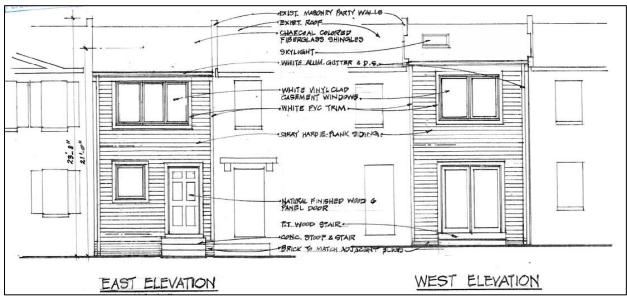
BAR#2014-0020 elevations; approved, with conditions
